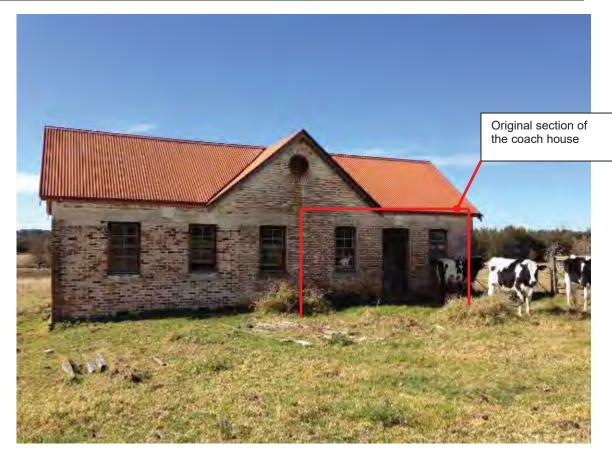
This images shows the original section on the west elevation of the coach house. Other openings have been reworked and the north end of the building demolished. TTA 2013
